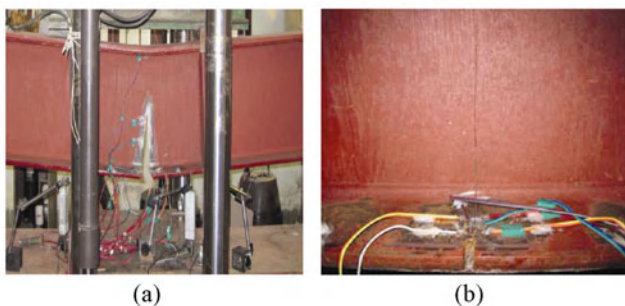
Typical failure of steel beam: (a) F-STE (b) F-HMC
